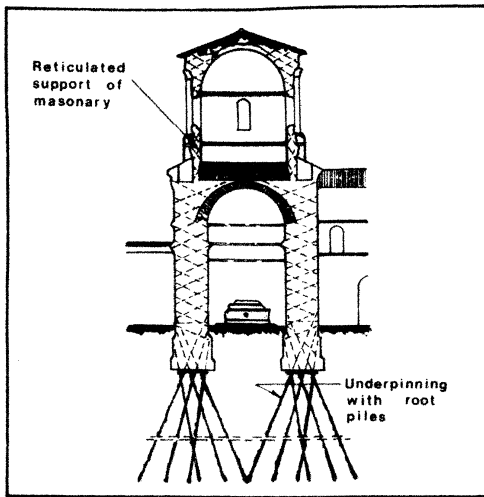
S. Andrea delle Fratte Church in Rome. Underpinning and masonry reinforcement.
